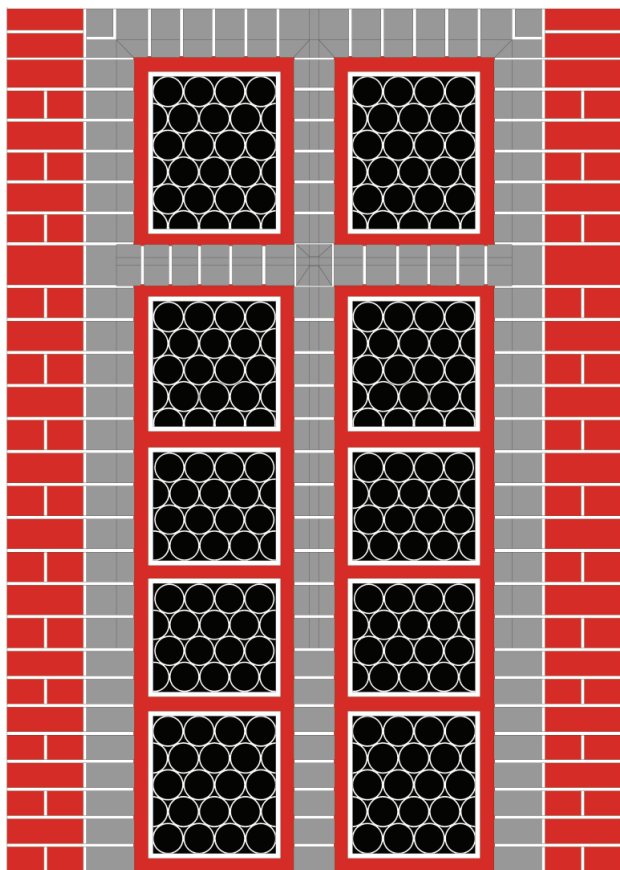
Reconstruction of the colors of a fragment of the upper floor with blank on the west elevation of the first Late-Gothic building of the town hall (by A. Legendziewicz)
